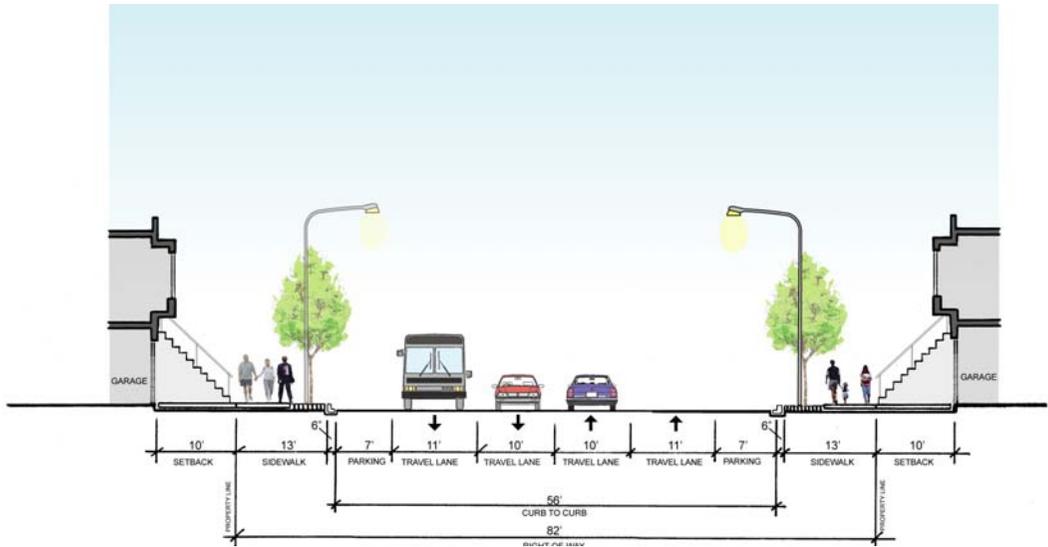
Option C calls for eliminating existing painted median and widening sidewalks on Geneva Avenue, with new street trees, between Alemany Boulevard and San Jose Avenue.
